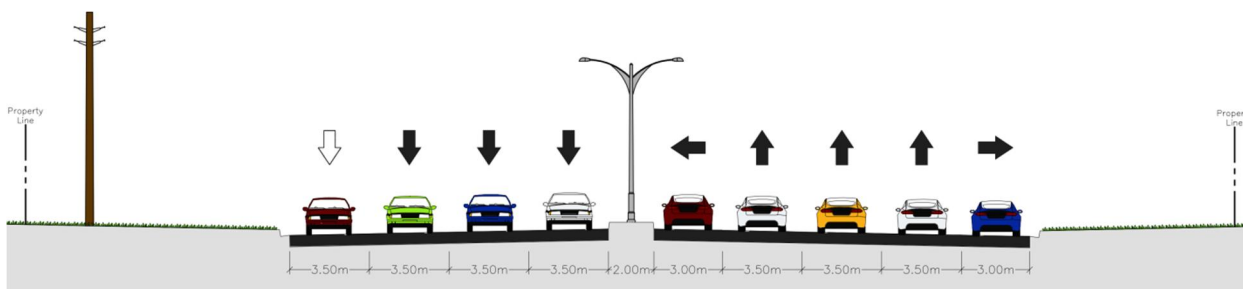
Preferred Design, Highbury Avenue North Cross-Section, South of Hamilton Road
